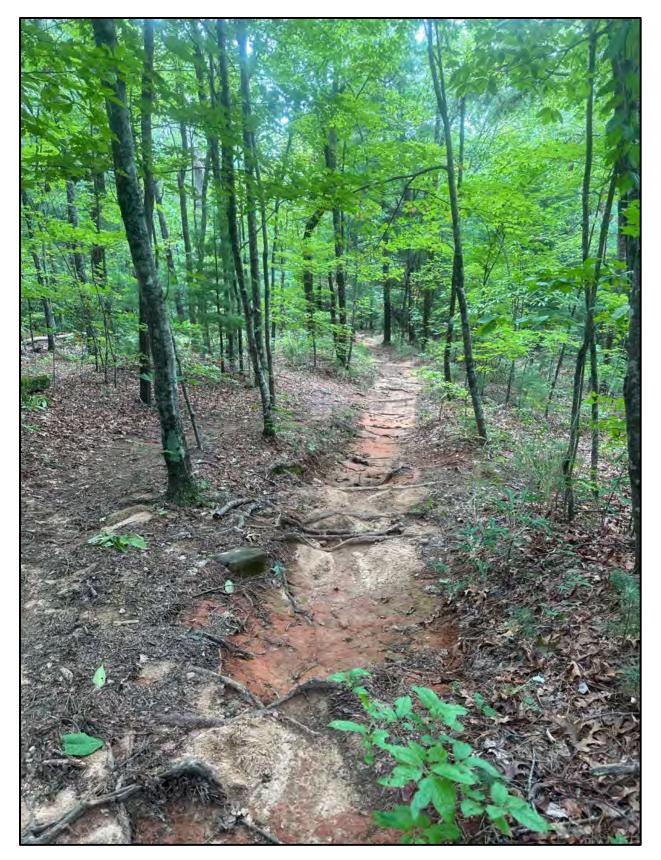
Trail Issue #13 - Lower Whitewater Falls Spur, Washout (see Figure 4.4)
